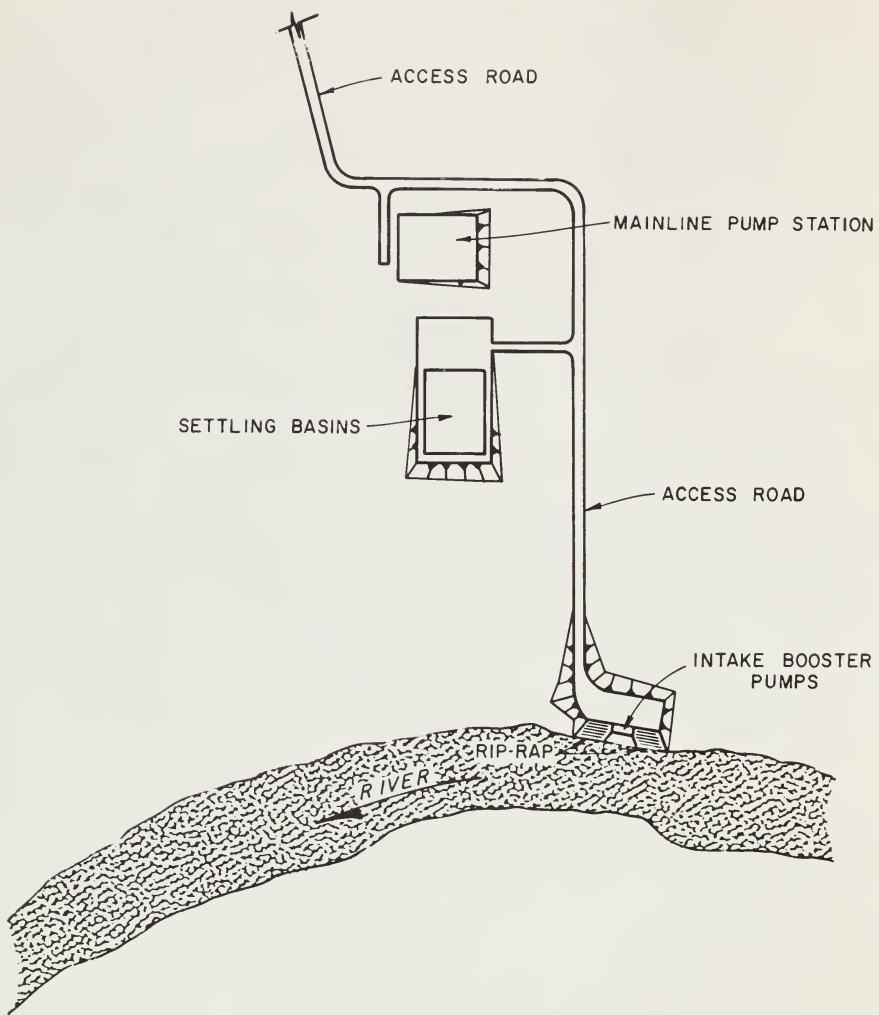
TYPICAL RIVER INTAKE AND PUMP STATION FACILITIES
